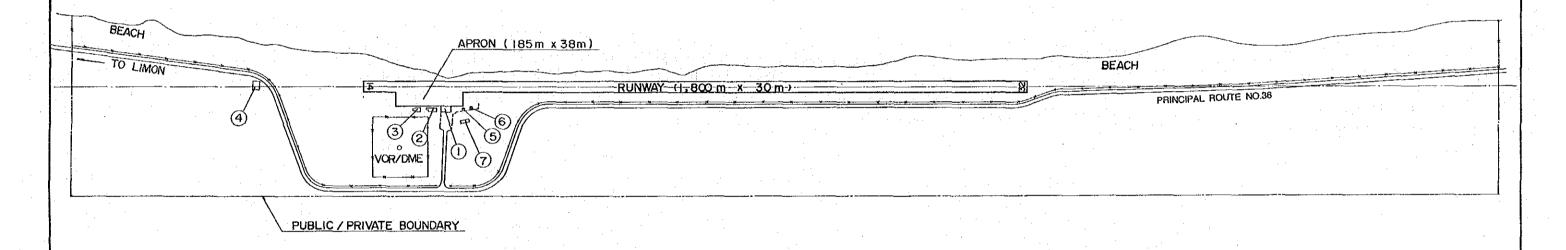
Layout Plan of Existing Limon International Airport
